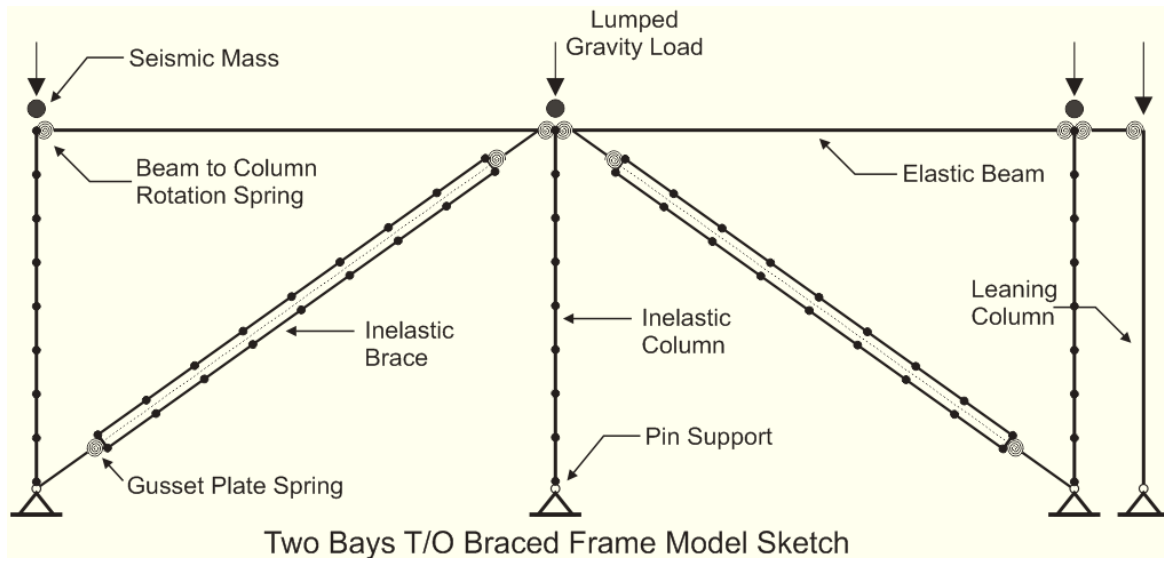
Model of the tension only braced frame with leaning columns at ground floor
